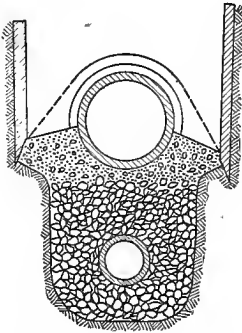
SUBDRAIN; SEWER ON CONCRETE SADDLE.
